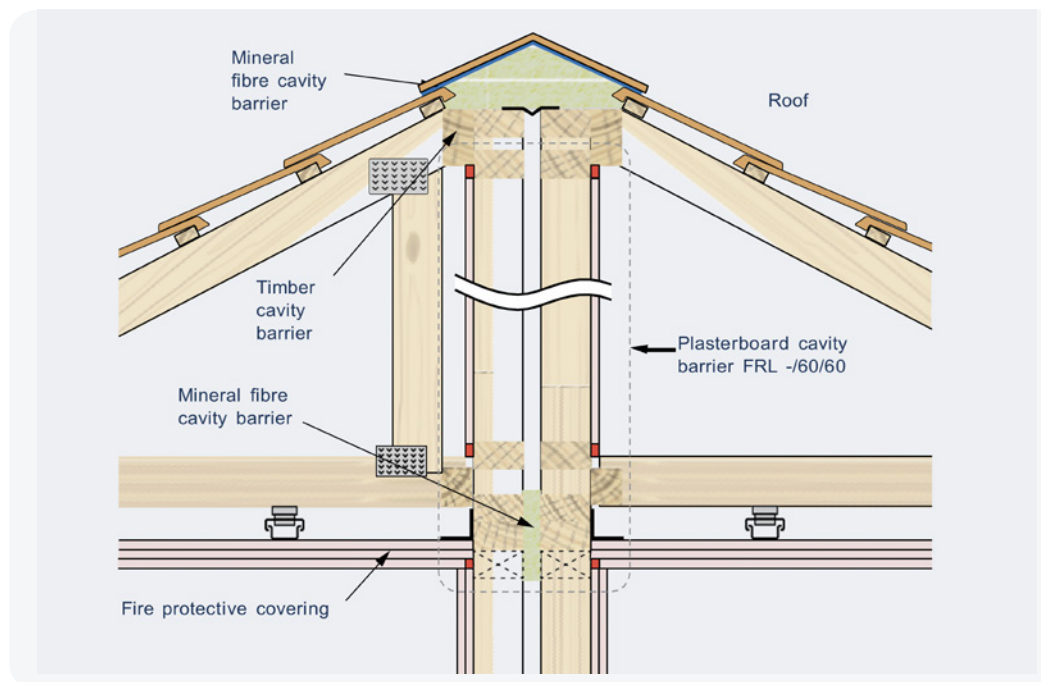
Roof space Option 2 fire-protected timber ceiling and cavity barriers within roof space.
